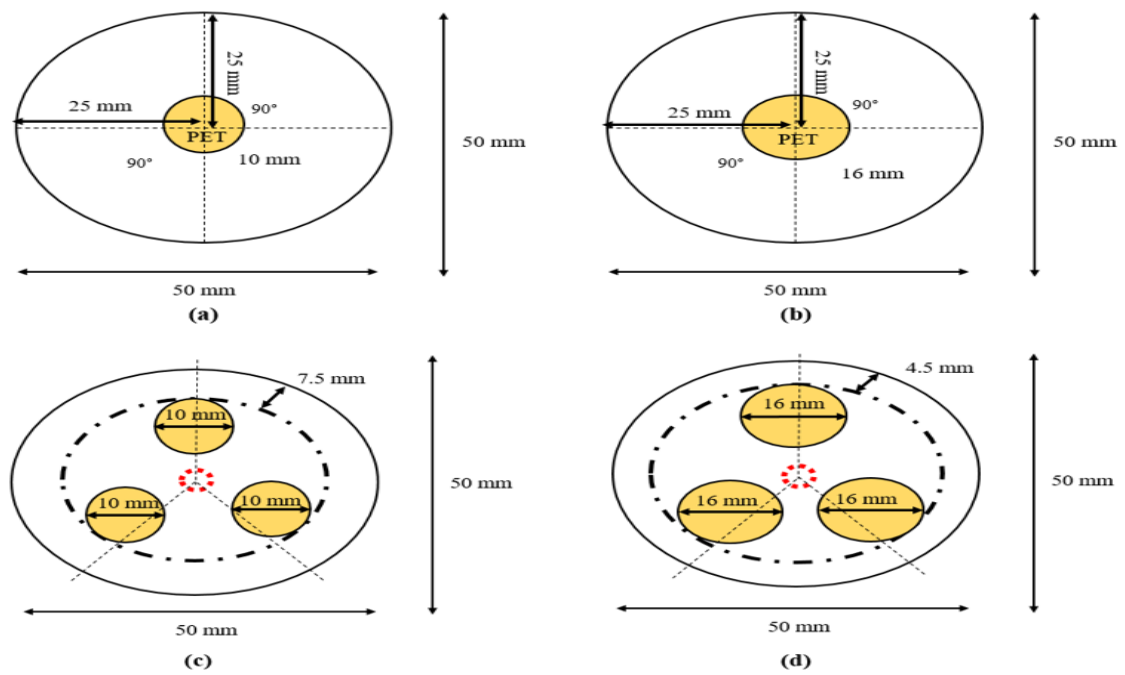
Detailed column arrangement for single and group PET column installed in clay specimens
